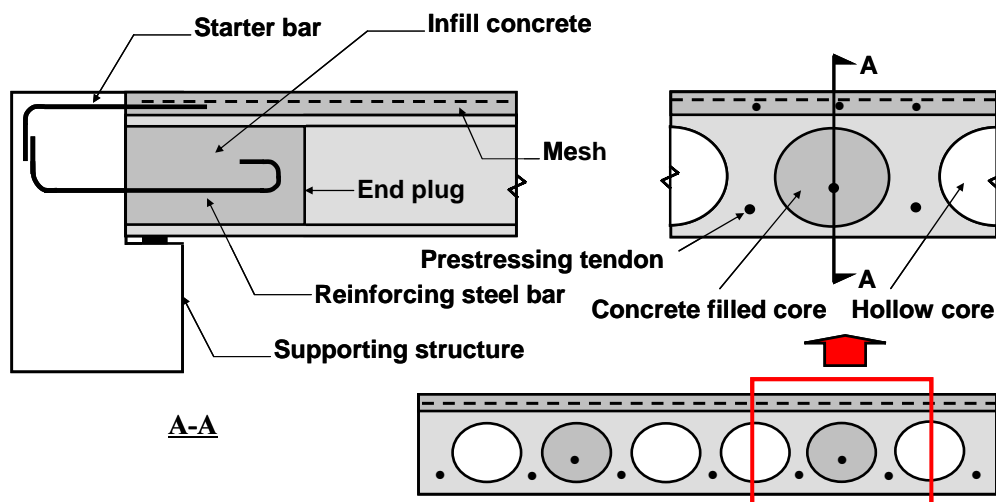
New floor-end beam connection detail of hollowcore floors
